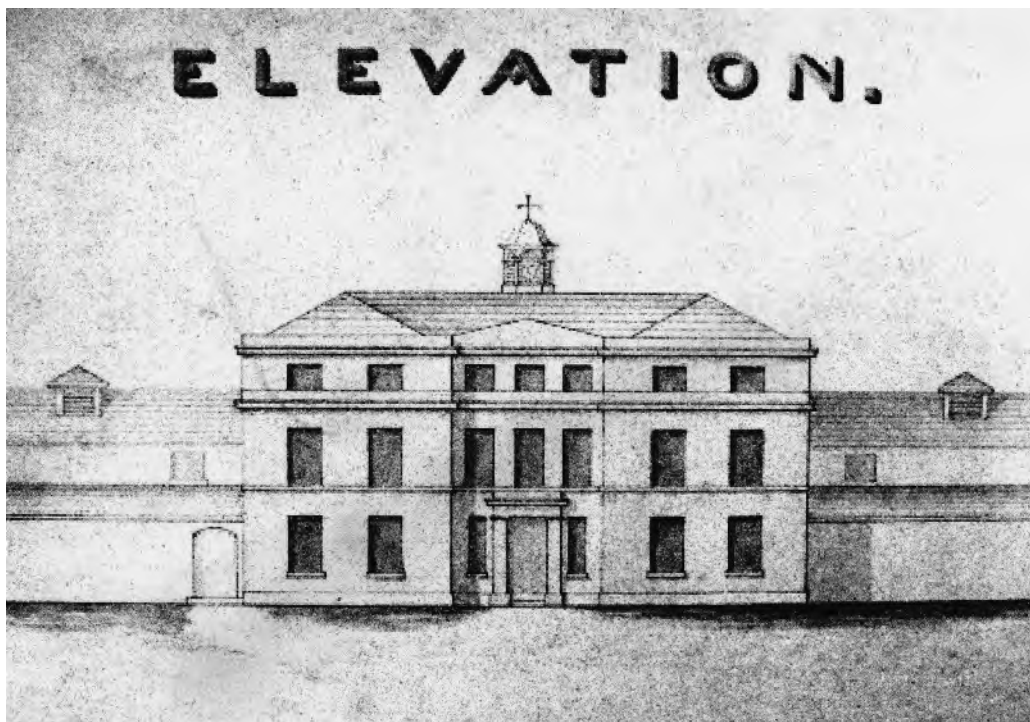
Elevation of the front building (to south) of Ludlow workhouse as originally designed by Matthew Stead in 1836. (Permission of Shropshire Archives: PL 9/9/2/1-4.)
